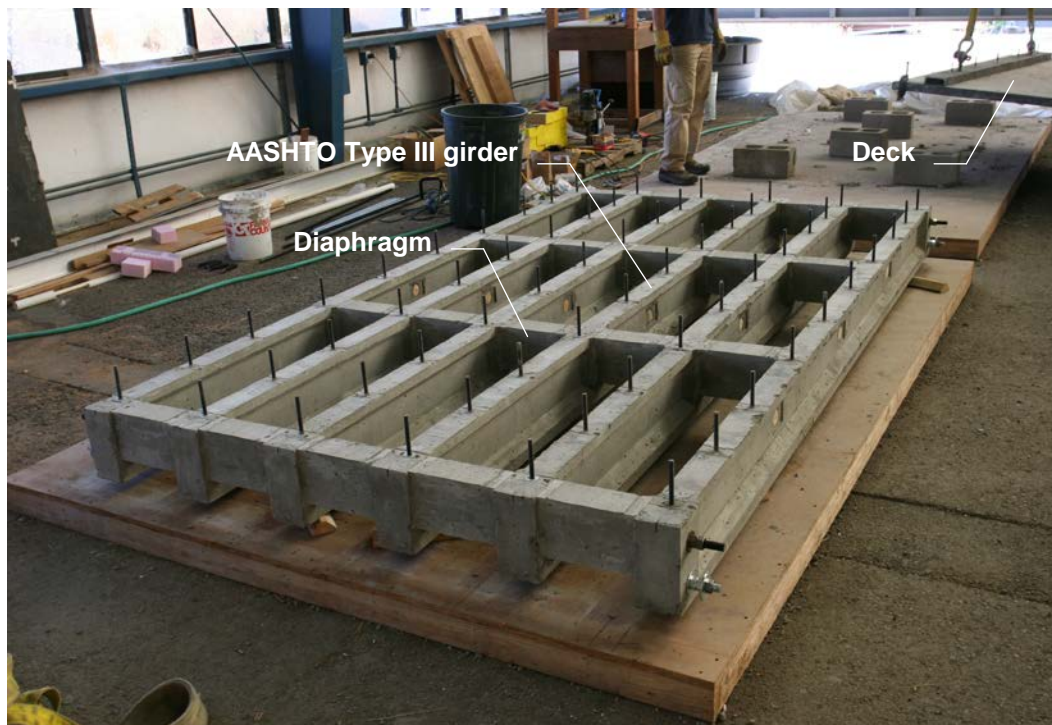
SPECIMEN ASSEMBLAGE OF GIRDERS AND DIAPHRAGMS BEFORE PLACEMENT OF DECK.
